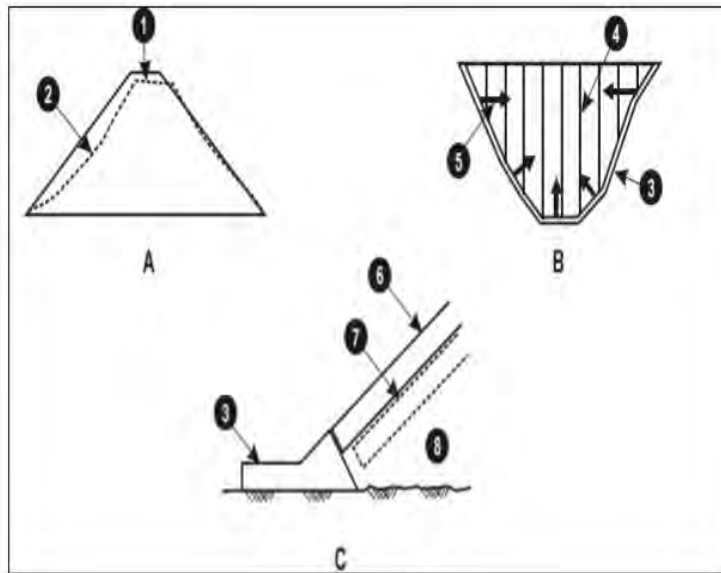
Embankment and face slab behaviour (Hedien, 2005-b)
